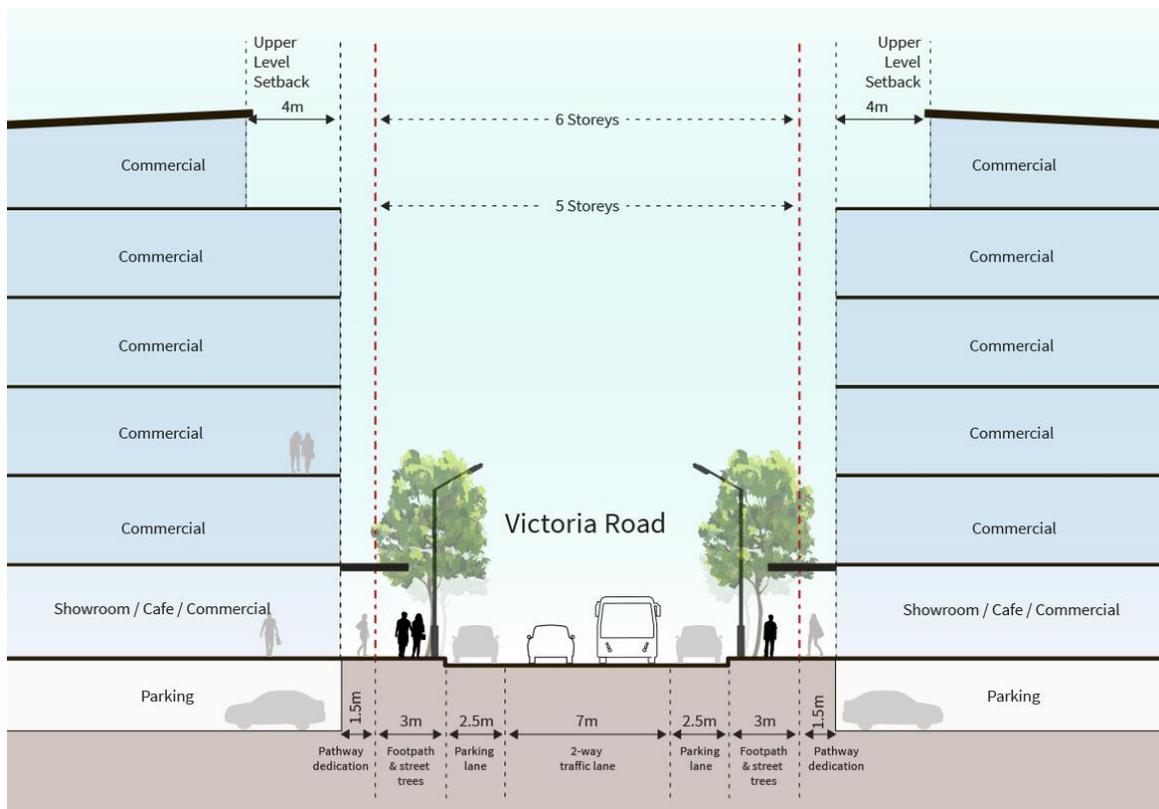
Street section 2 - Victoria Road (B5 Business Development zone)
